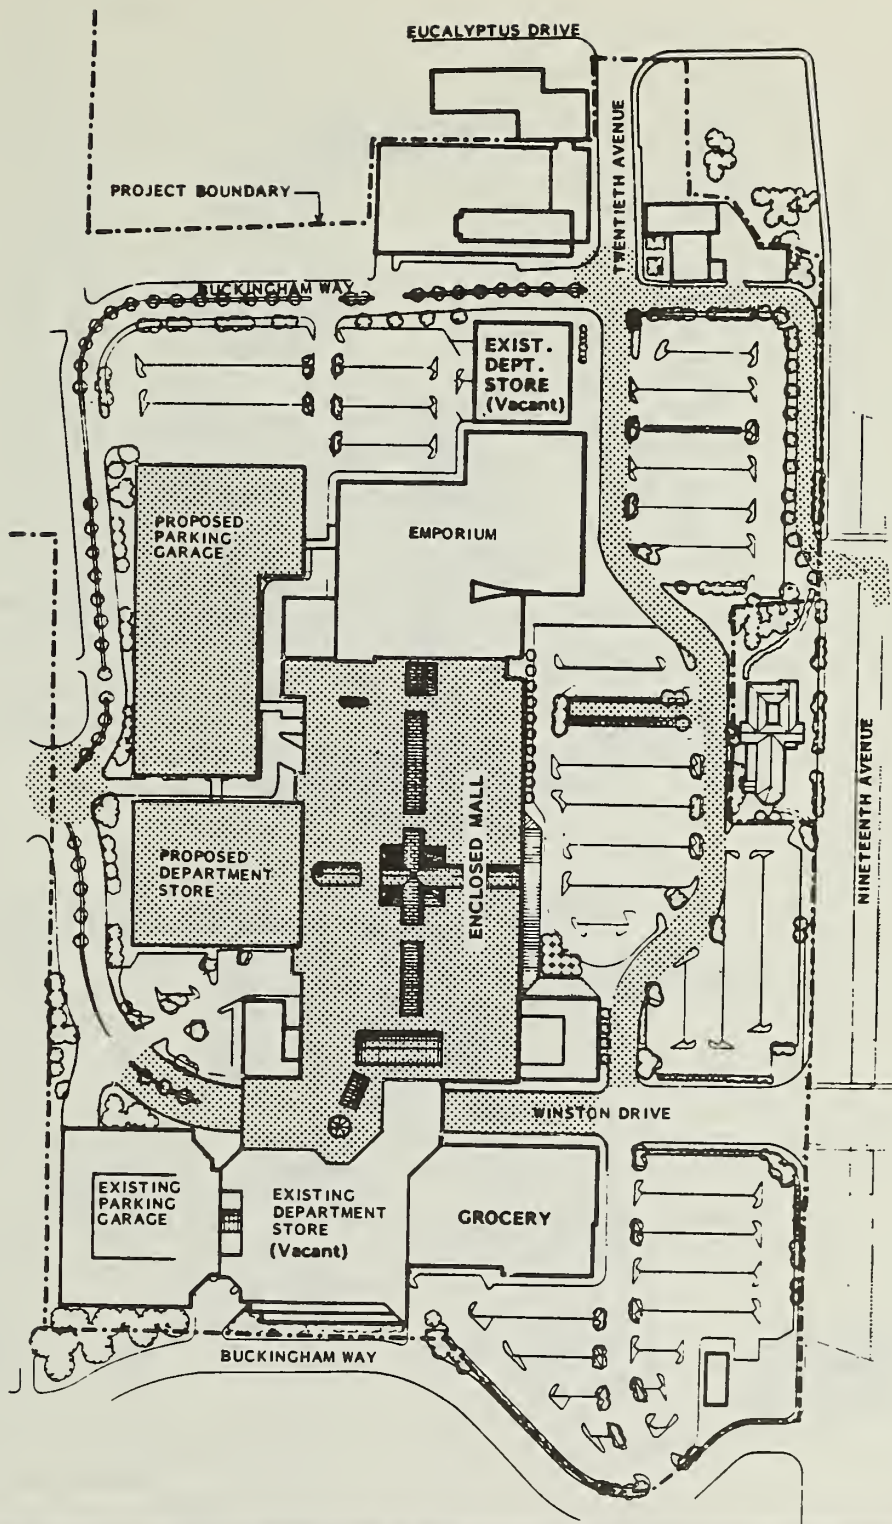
SITE PLAN - PROPOSED STONESTOWN DEVELOPMENT
